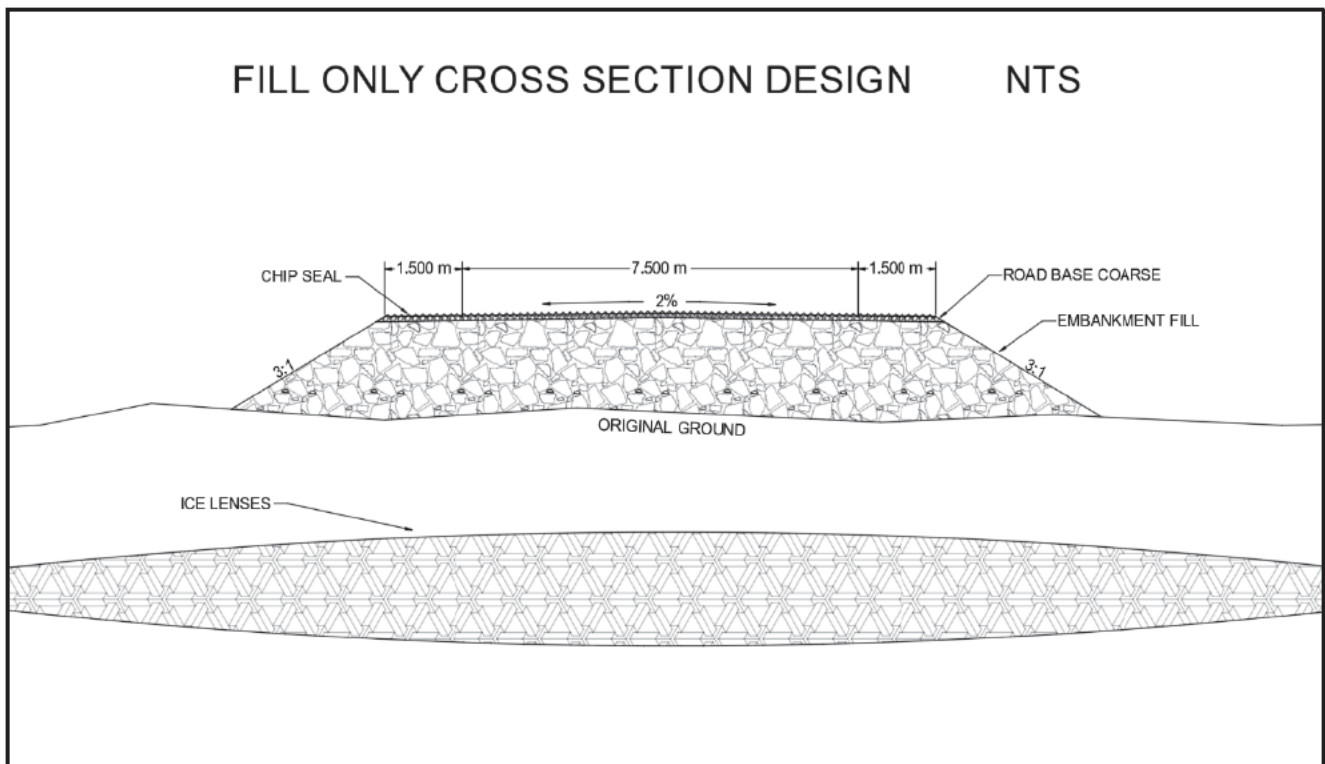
Typical Cross Section Detail for Fill Only Road Design.
